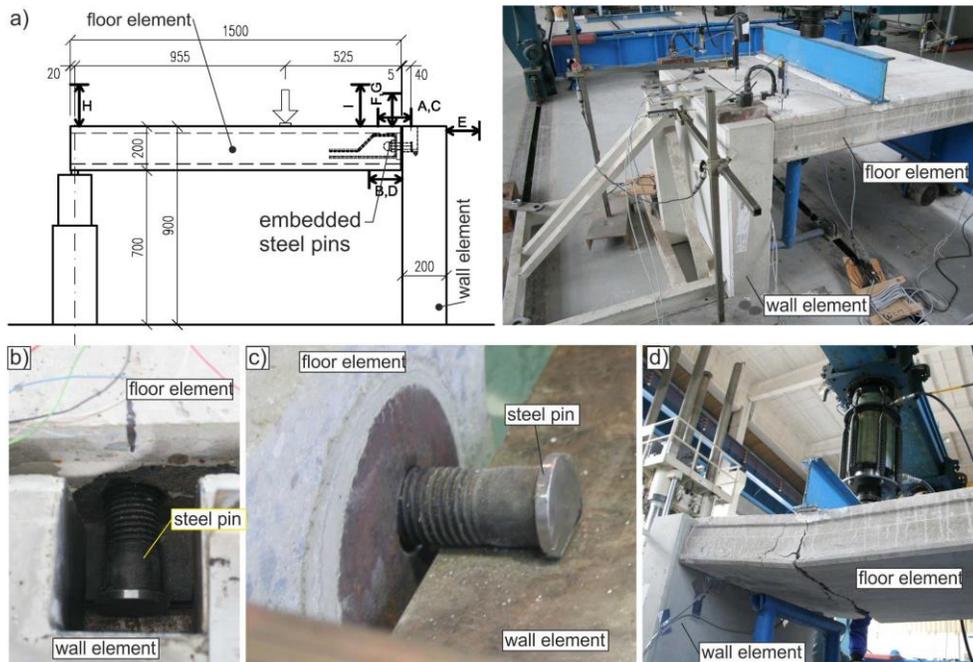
a) Test configuration scheme, mounting of strain gauges, detail of mounting, b) Steel pin before test, c) Steel pin after test, d) Failure of the test configuration at reaching limit load.
